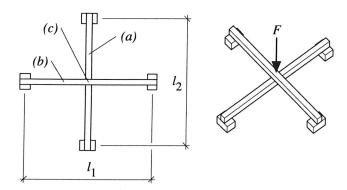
Two-way orthogonal beam grid system (plan and perspective views). (a) Beam 2, (b) beam 1, (c) load F.
